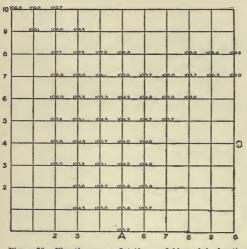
Elevations on a flat 40-acre field used in locating an open ditch and branch tile drains. The outlet of the open drain, which is 3.2 feet below the general surface at A, was taken as 100 feet above datum, and all figures show the elevation of the respective points above that datum plane. drain follows the lowest level, even if the ditch is full of snow and ice, this soon melts or is worn away by the water from the higher surfaces which runs over it.
